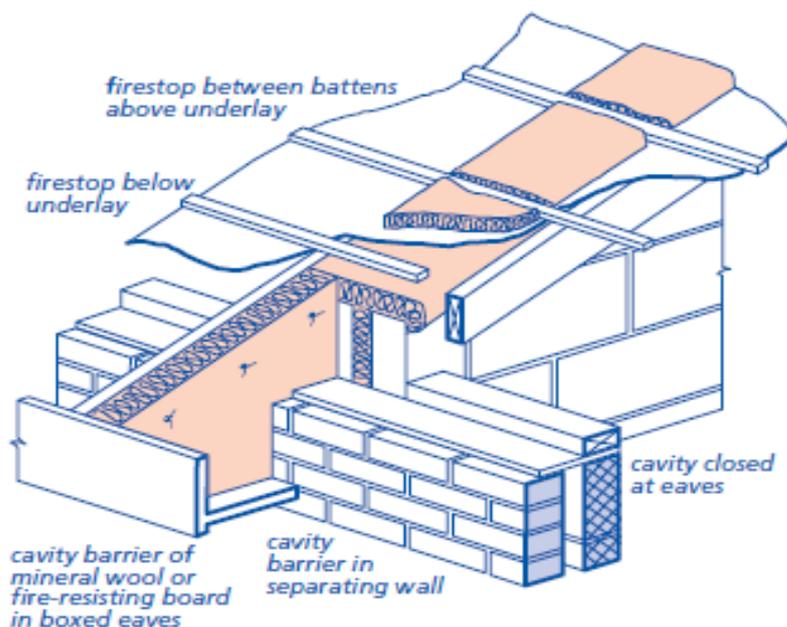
Section showing typical detailing for fire stopping between compartment wall and roof covering (from Diagram 30 of Approved Document B)
